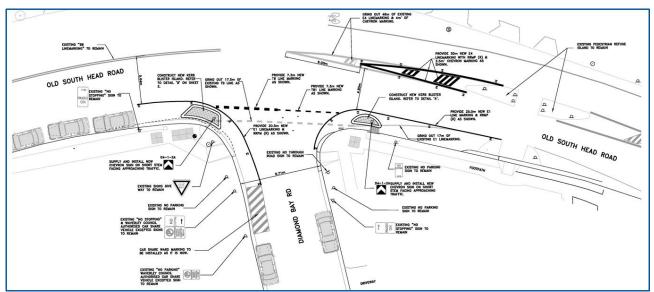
Proposed arrangements at Old South Head Road and Diamond Bay Road
